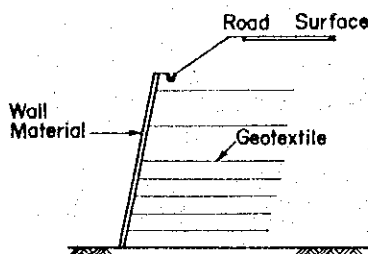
Conceptional Sketch of Reinforced Earth Wall
